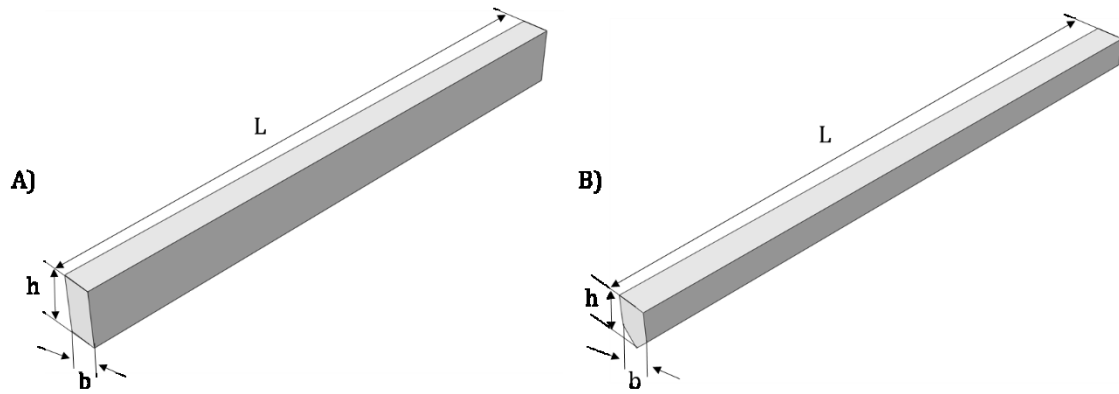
Geometry of 3D Beam A) Rectangular, B) Right-pentagonal
